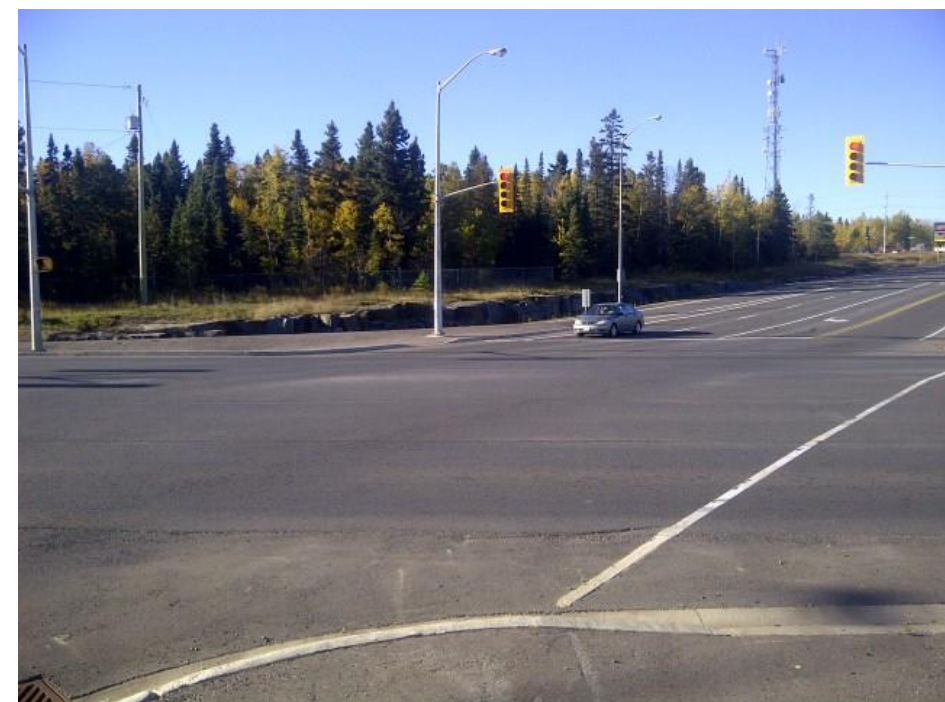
Looking west at Highway 11/17 – Balsam Street Intersection
